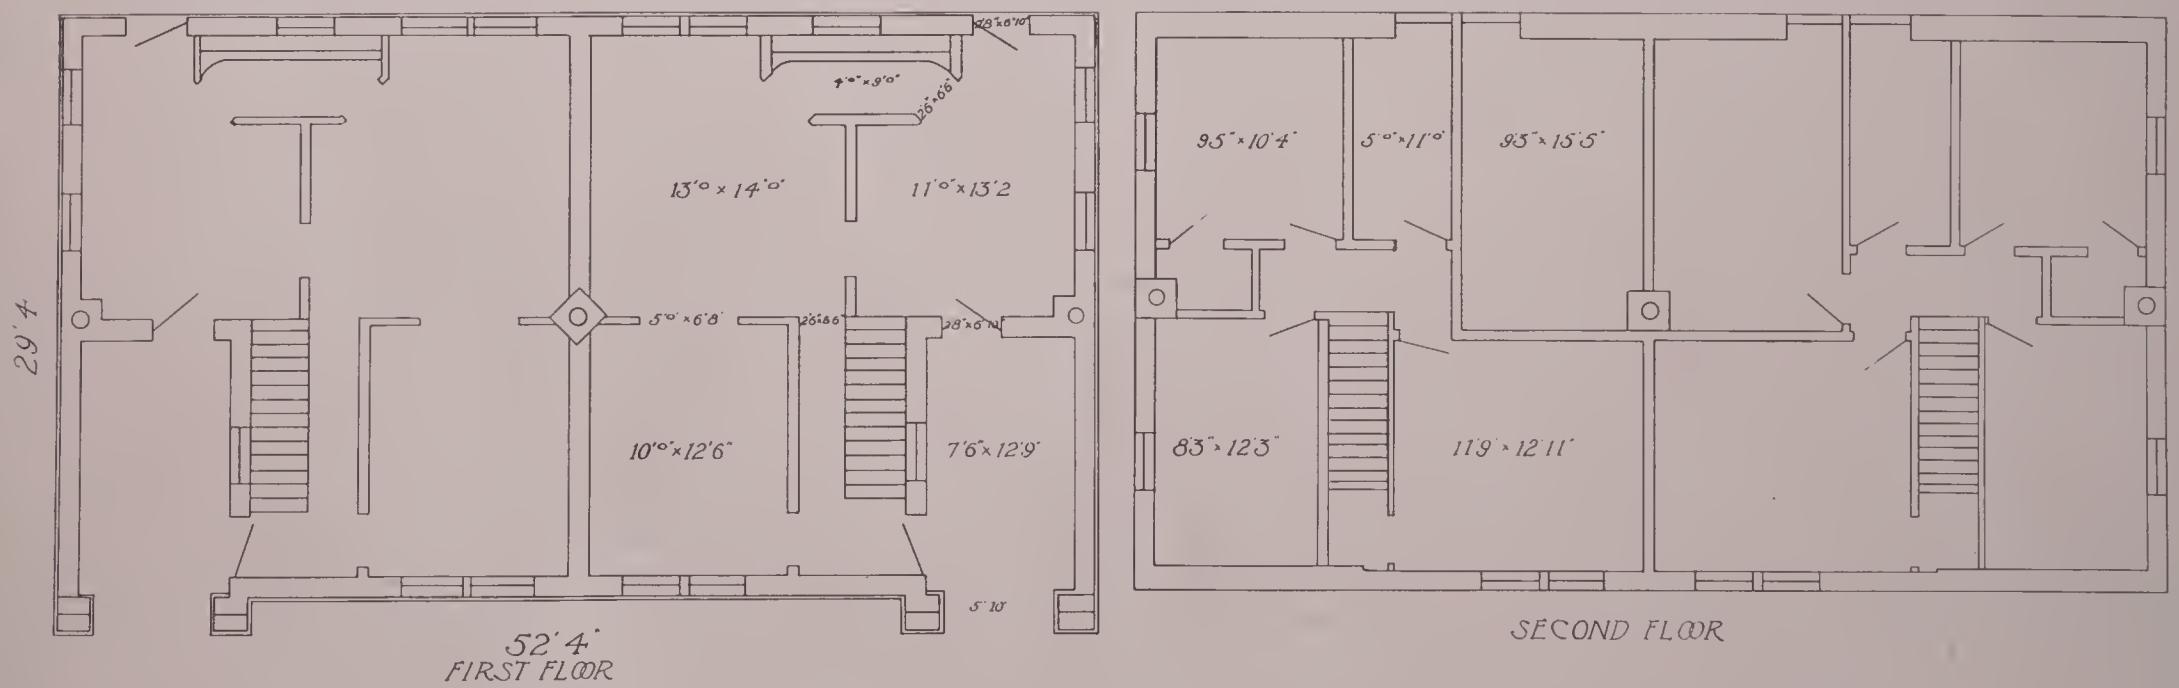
PLATE XIa.—Floor plans of twin house built of concrete and erected by Witherbee, Sherman & Co. at Mineville, N. Y. Cost,
